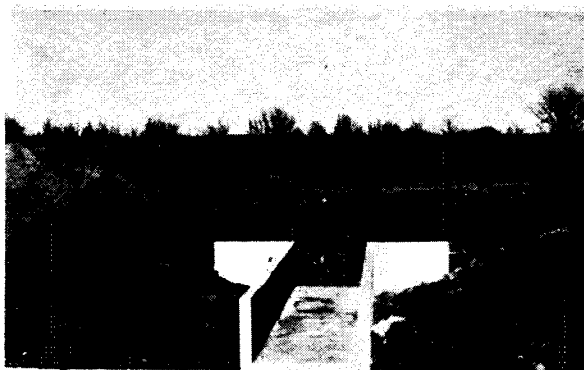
Rectangular concrete drain inlet to a concrete-lined canal section. P-430-500-383
